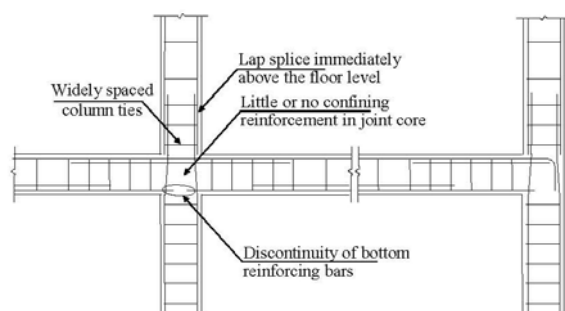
Typical non-seismic reinforcing detail of RC frame designed for gravity load only.
